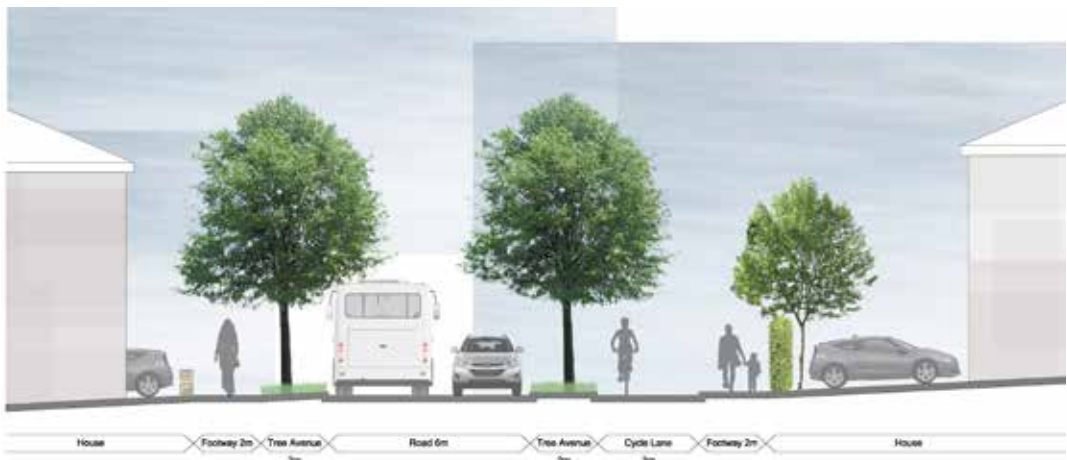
STREET SECTION, MAIN ACCESS ROAD - AVENUE - PHASE 3
